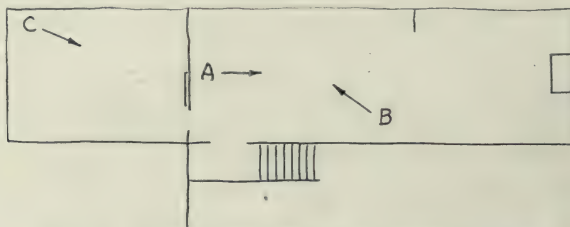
PLAN OF WORKSHOP, SALICIS SCHOOL, PARIS.
